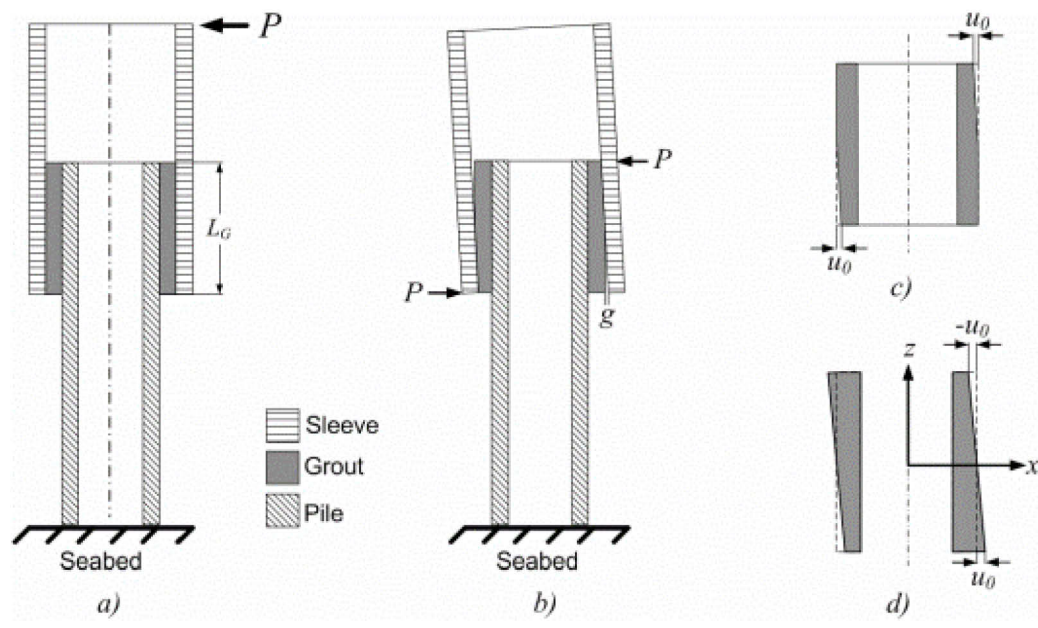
Structural behaviour of the grout due to horizontal load transfer from the transition piece to the pile (temporary supports not shown)
